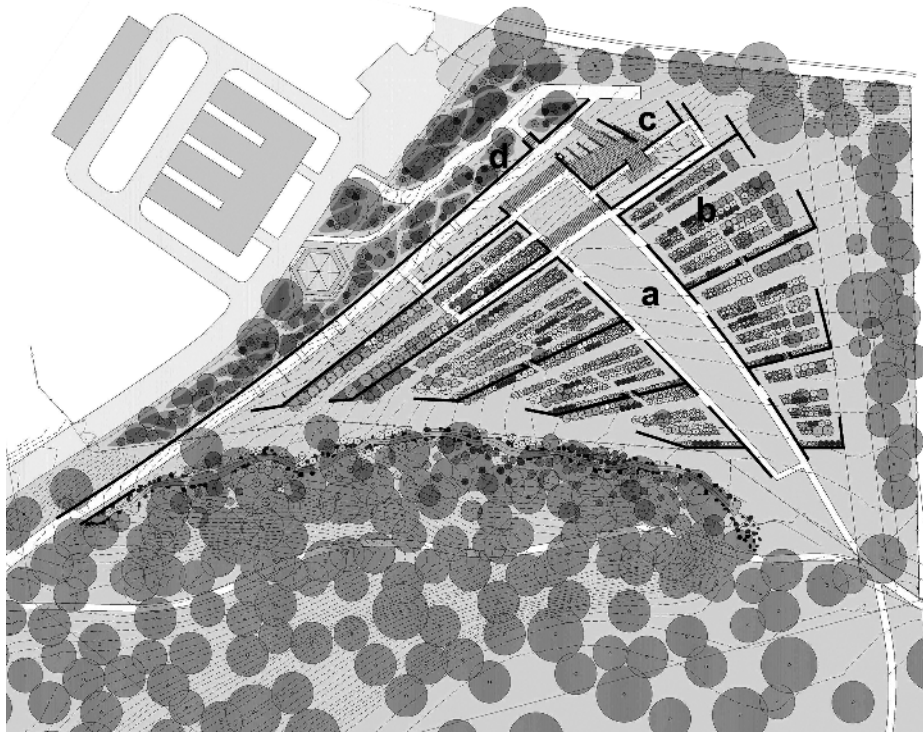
Plan of the Leventritt Garden at the Arnold Arboretum. (a) Central lawn panel. (b) Terraces. (c) Garden pavilion. (d) Great wall. (Plan: Reed Hilderbrand)
